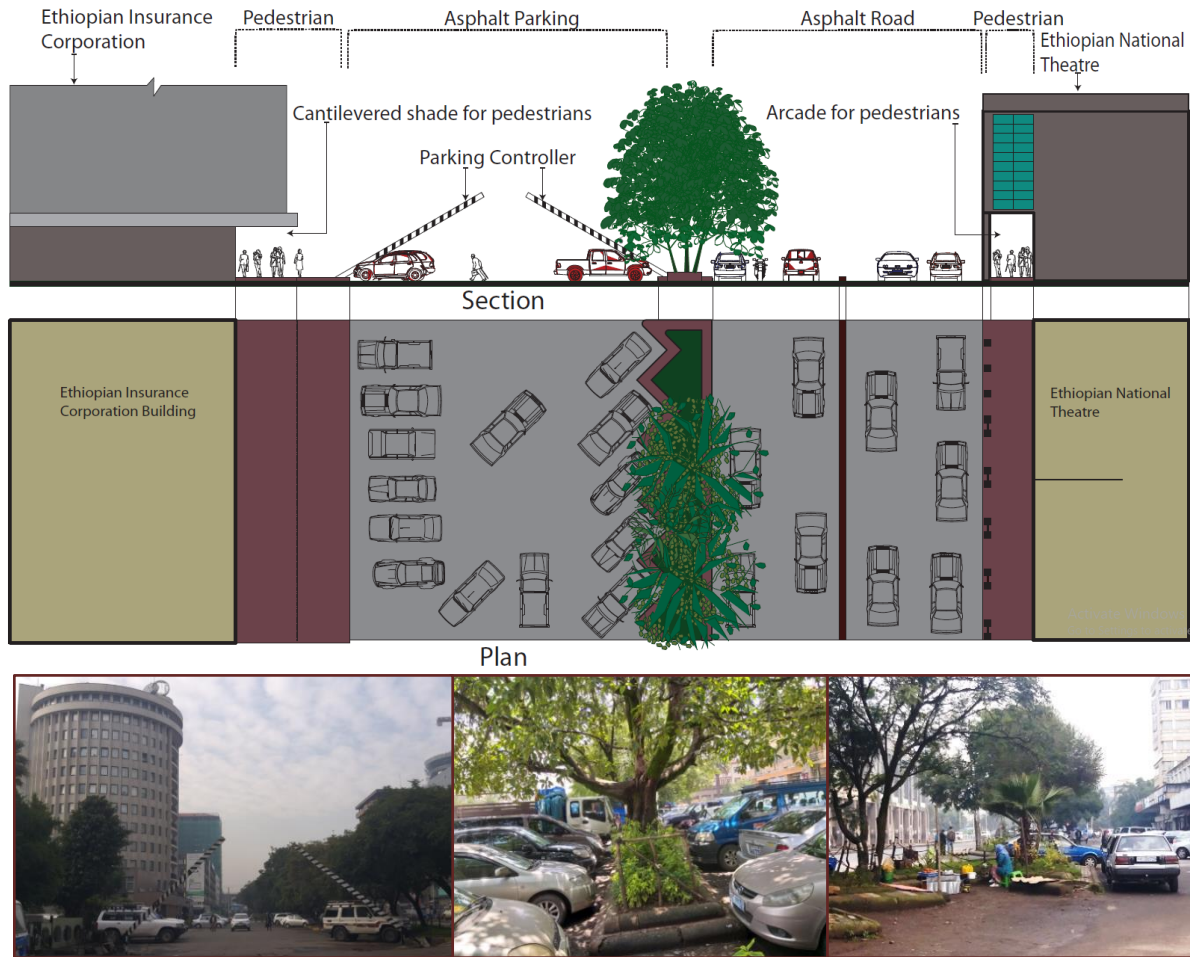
20 Section, plan, and some pictures characterizing the Gambia Street
